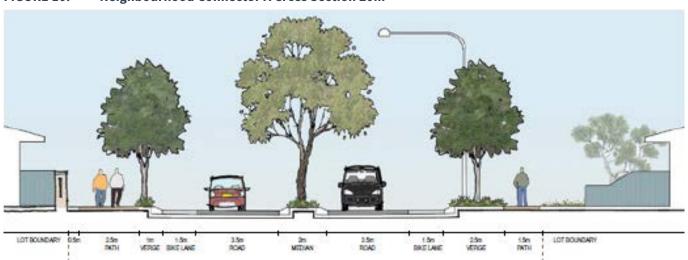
Neighbourhood Connector A Cross Section 20m
